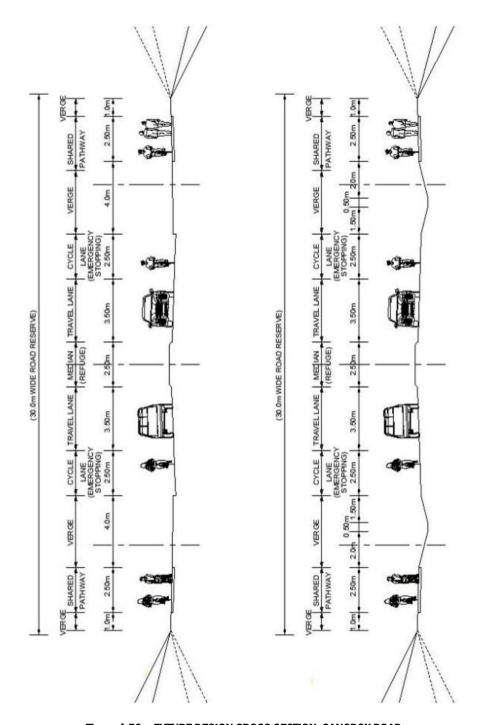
FUTURE DESIGN CROSS SECTION, SANCROX ROAD
